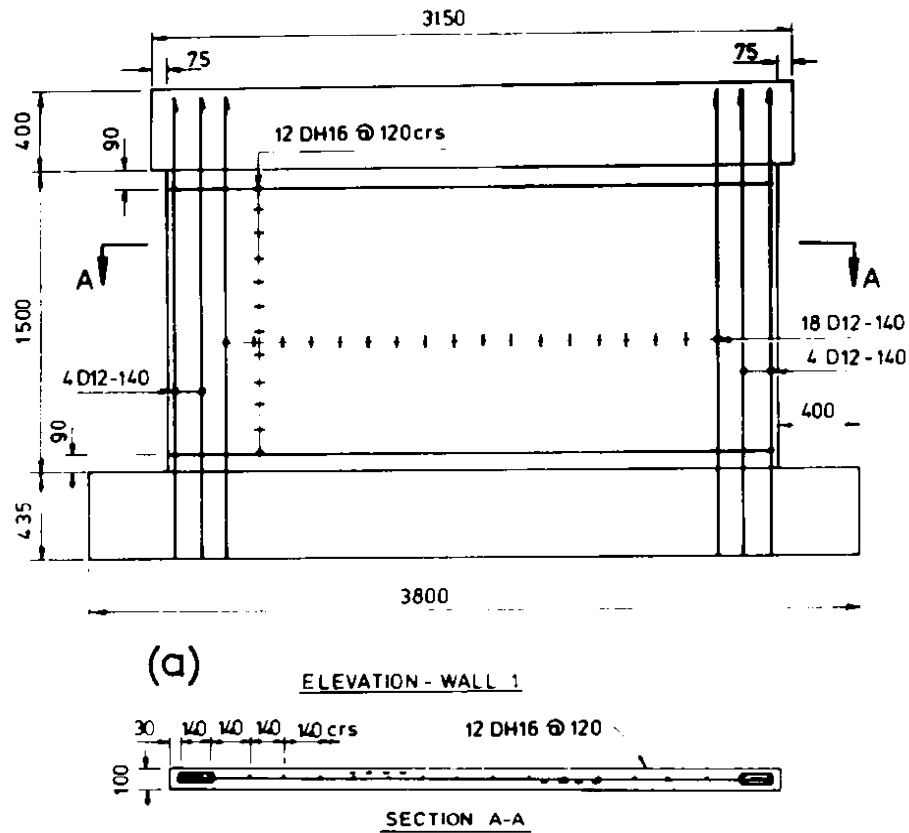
Arrangement of reinforcement of specimen Wall 1 (Paulay et al. 1982)
